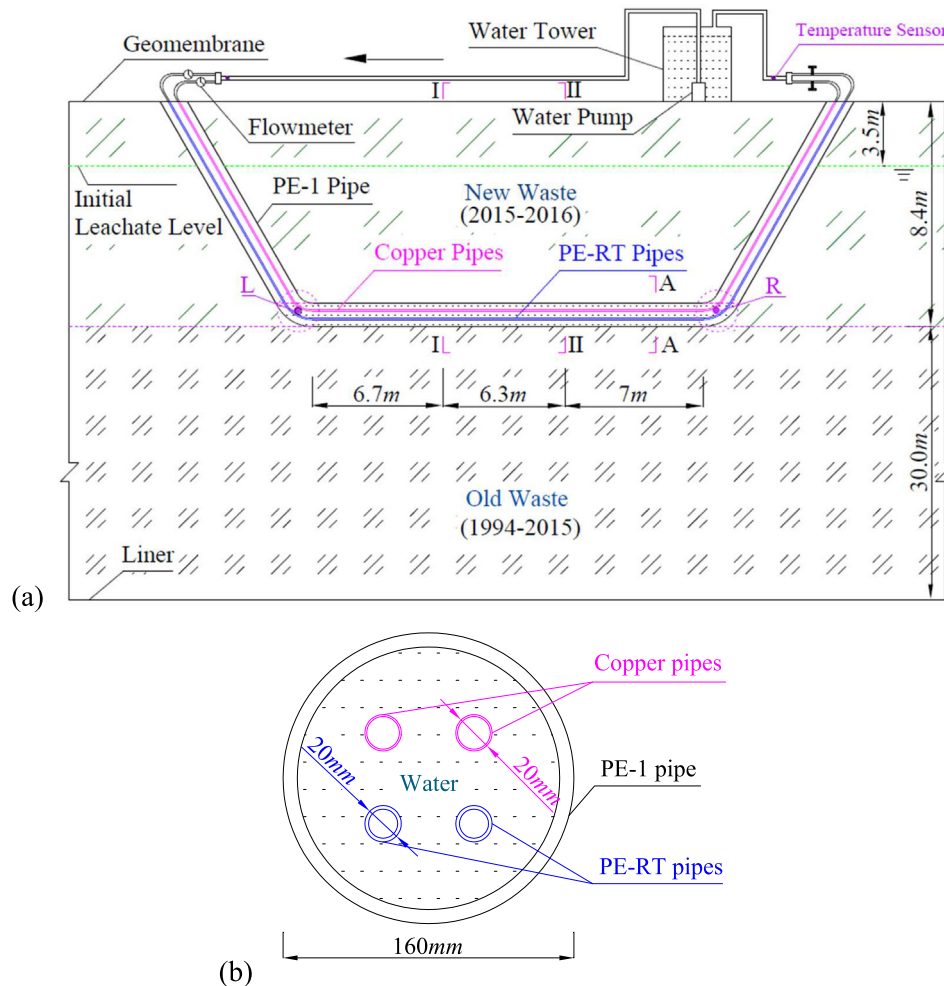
Prototype heat exchange system: (a) schematic drawing of prototype heat exchange system; (b) schematic cross-section (Section A) of the water circulation pipes.
